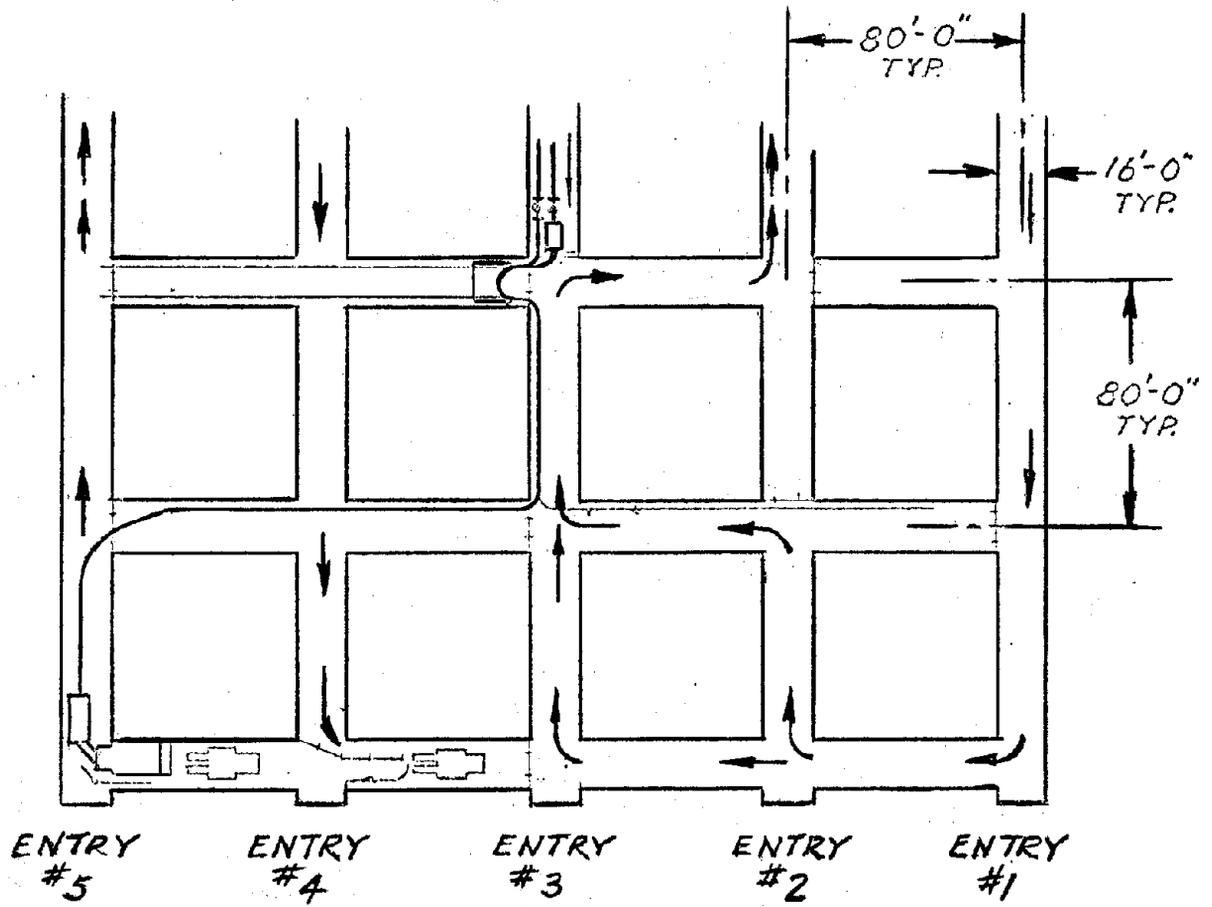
Mine Plan; Last Cut in Entry No. 5
